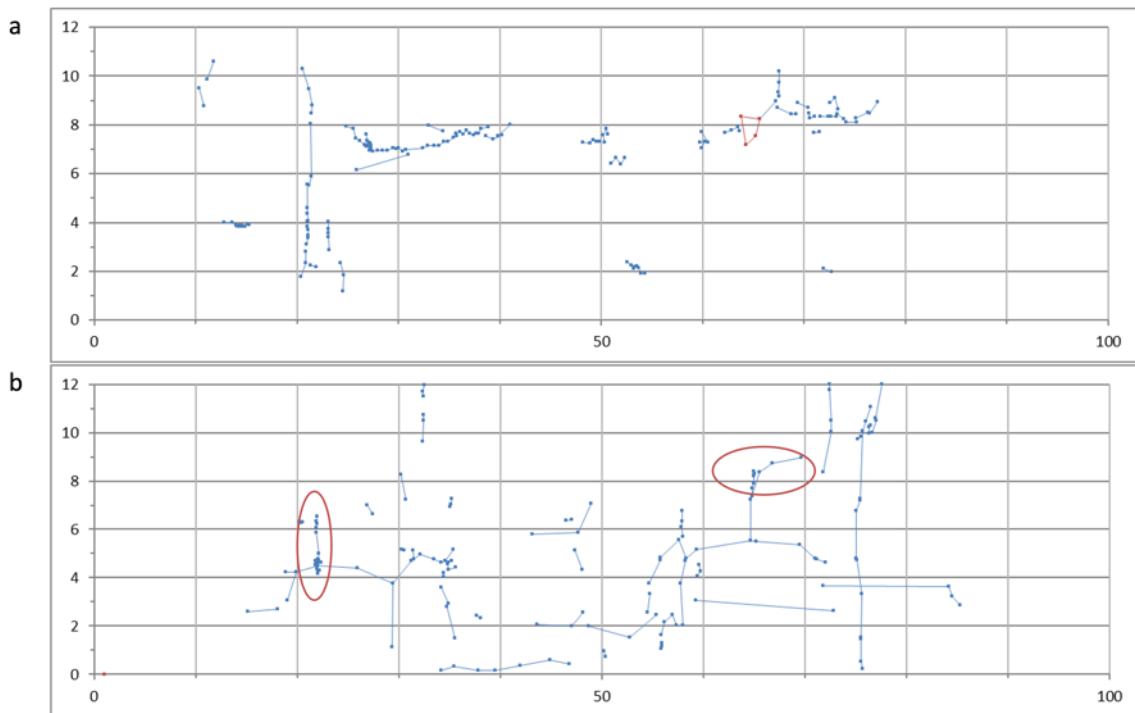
Section E7A Cracking Results (a) Prior to Construction (b) After Loading
